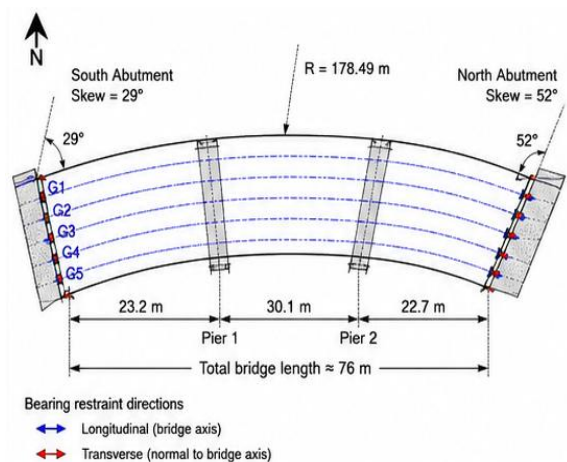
Plan geometry of the real Pennsylvania curved and skewed steel I-girder bridge
